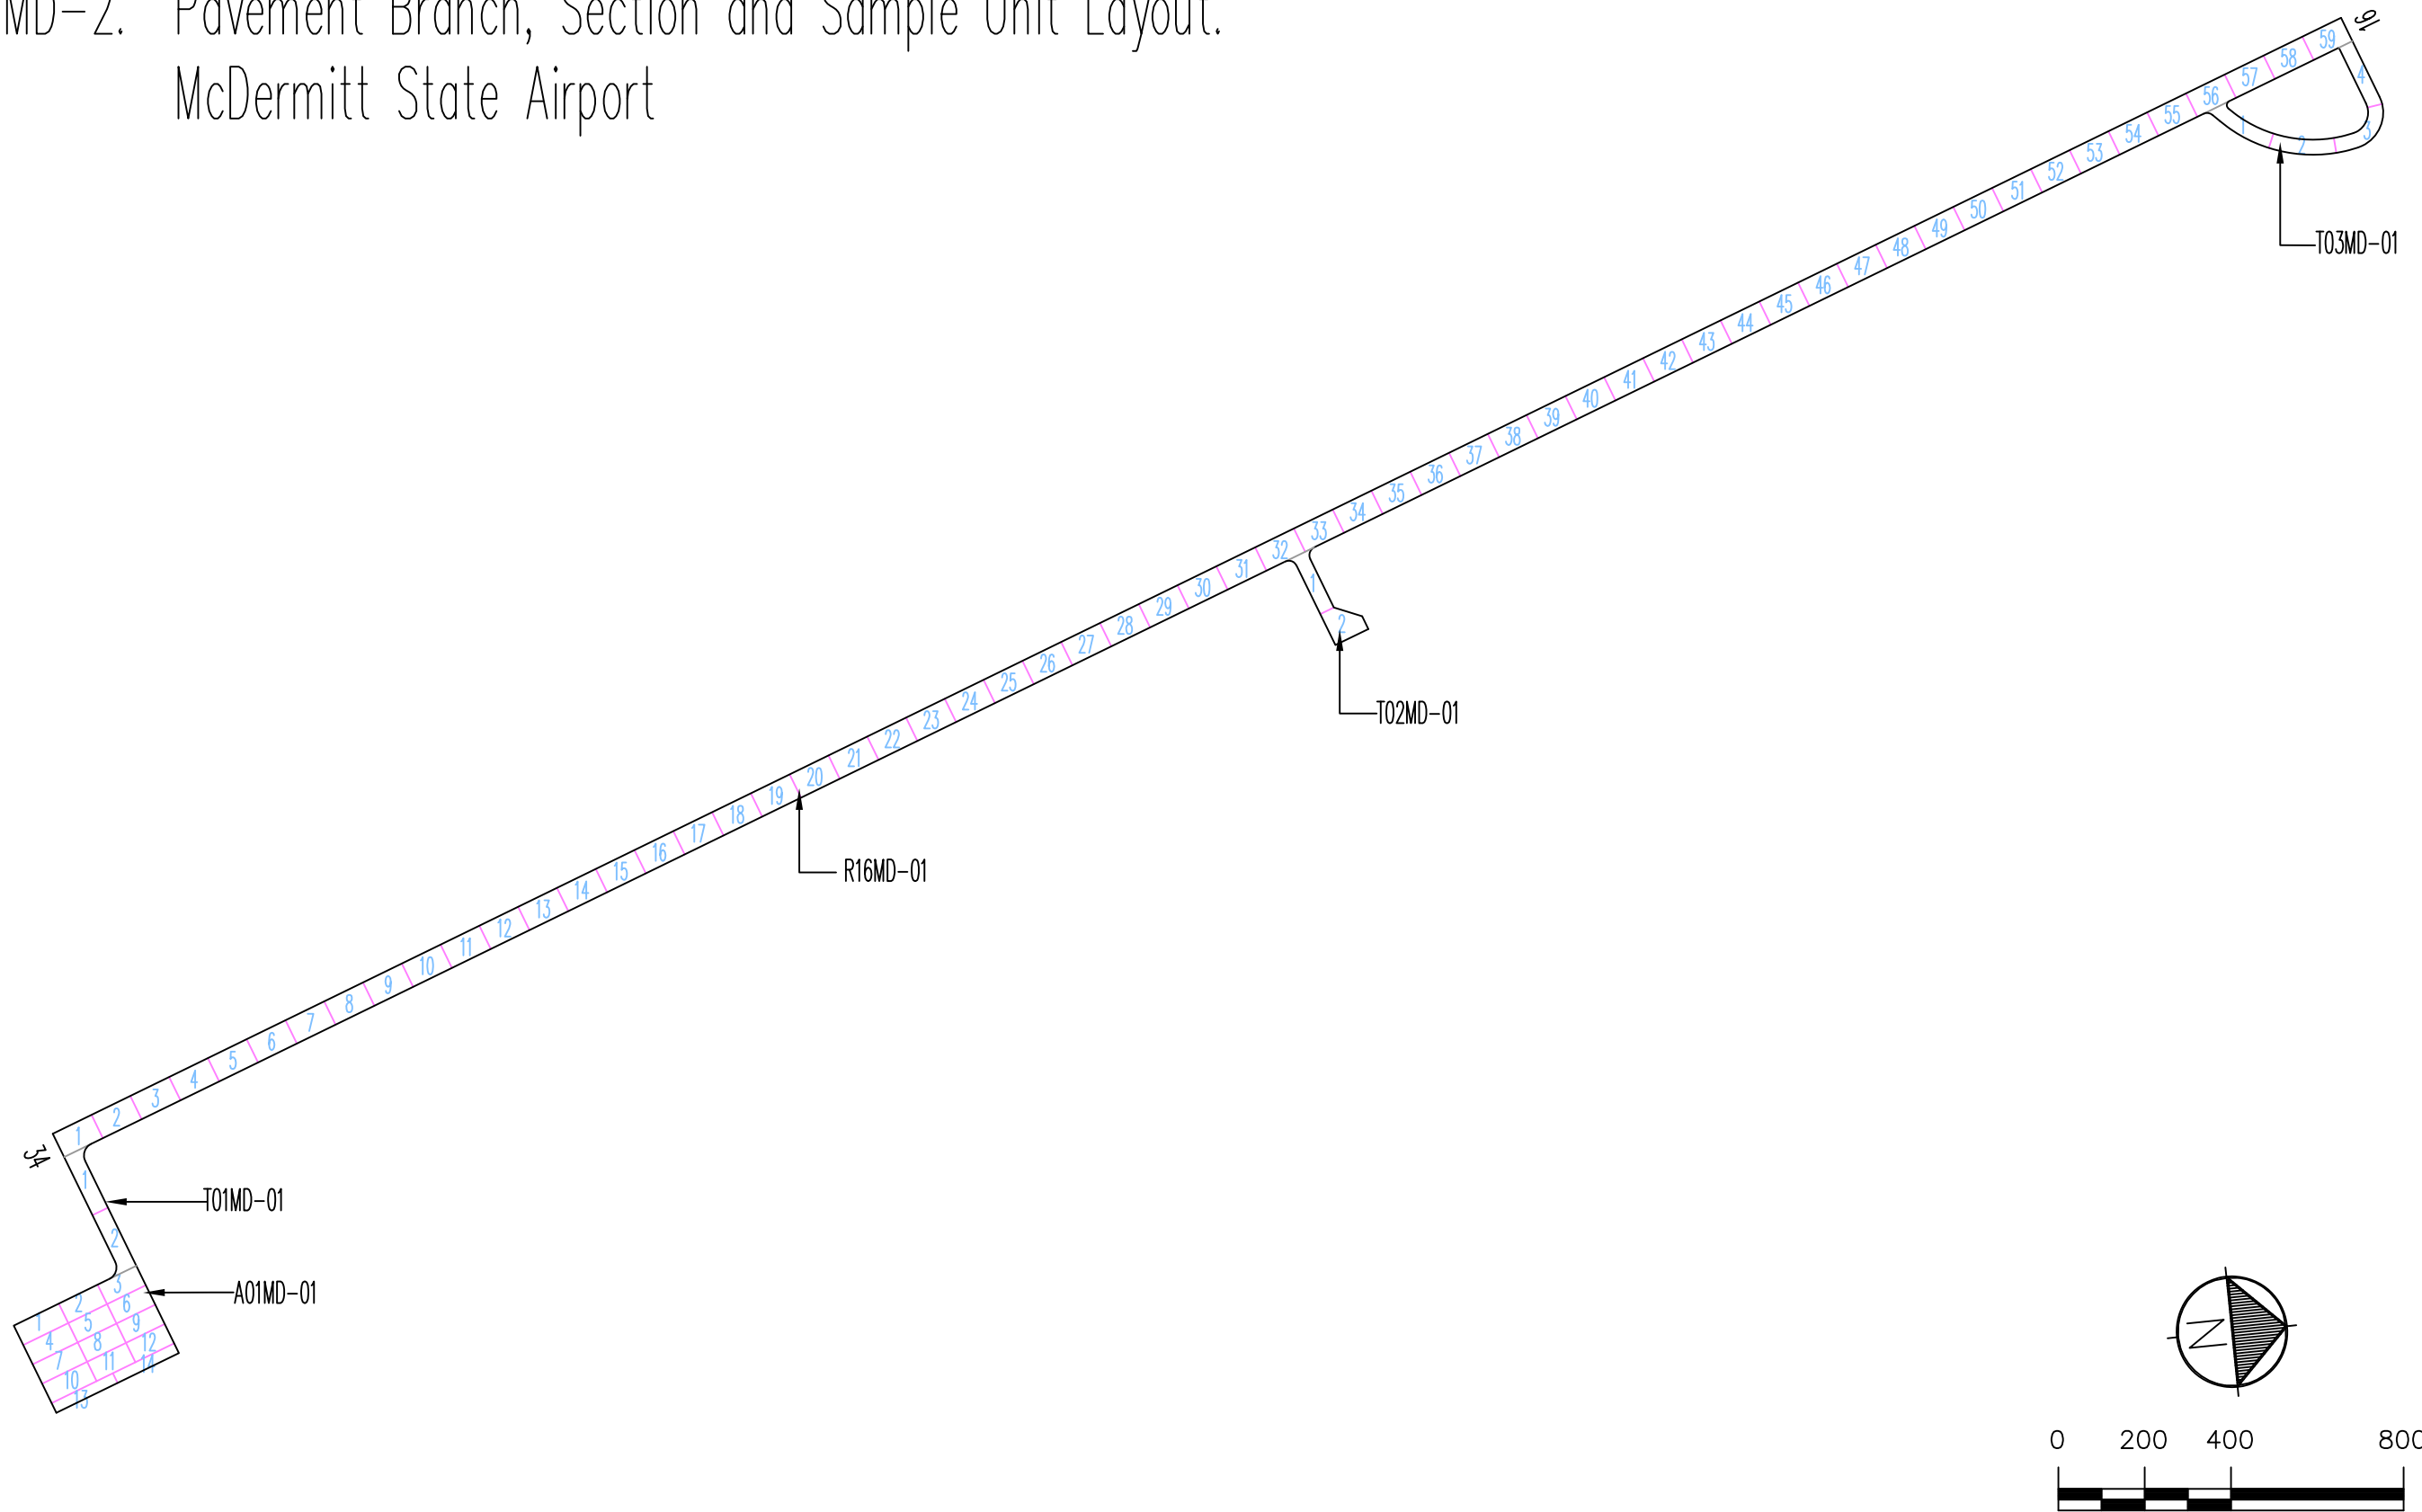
Pavement Branch, Section and Sample Unit Layout.
